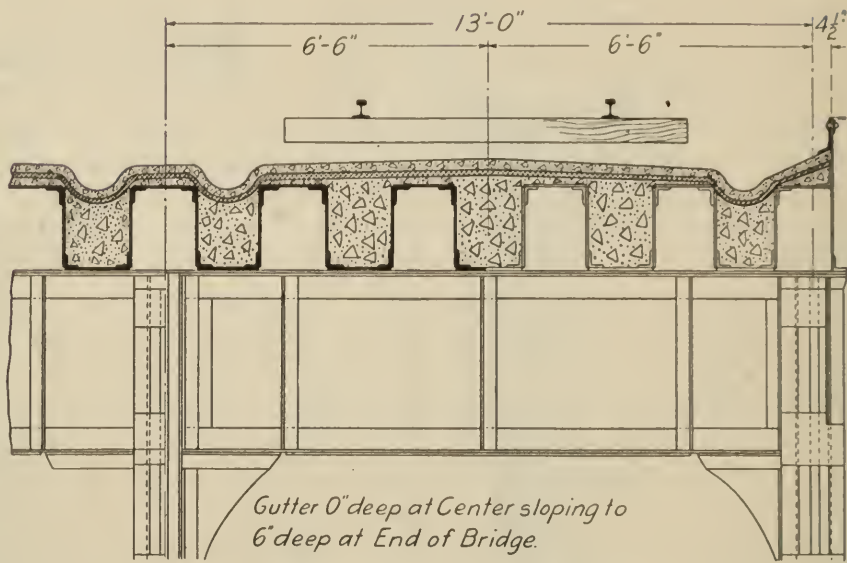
Section of Subway Over Kinzie Street, Chicago.
